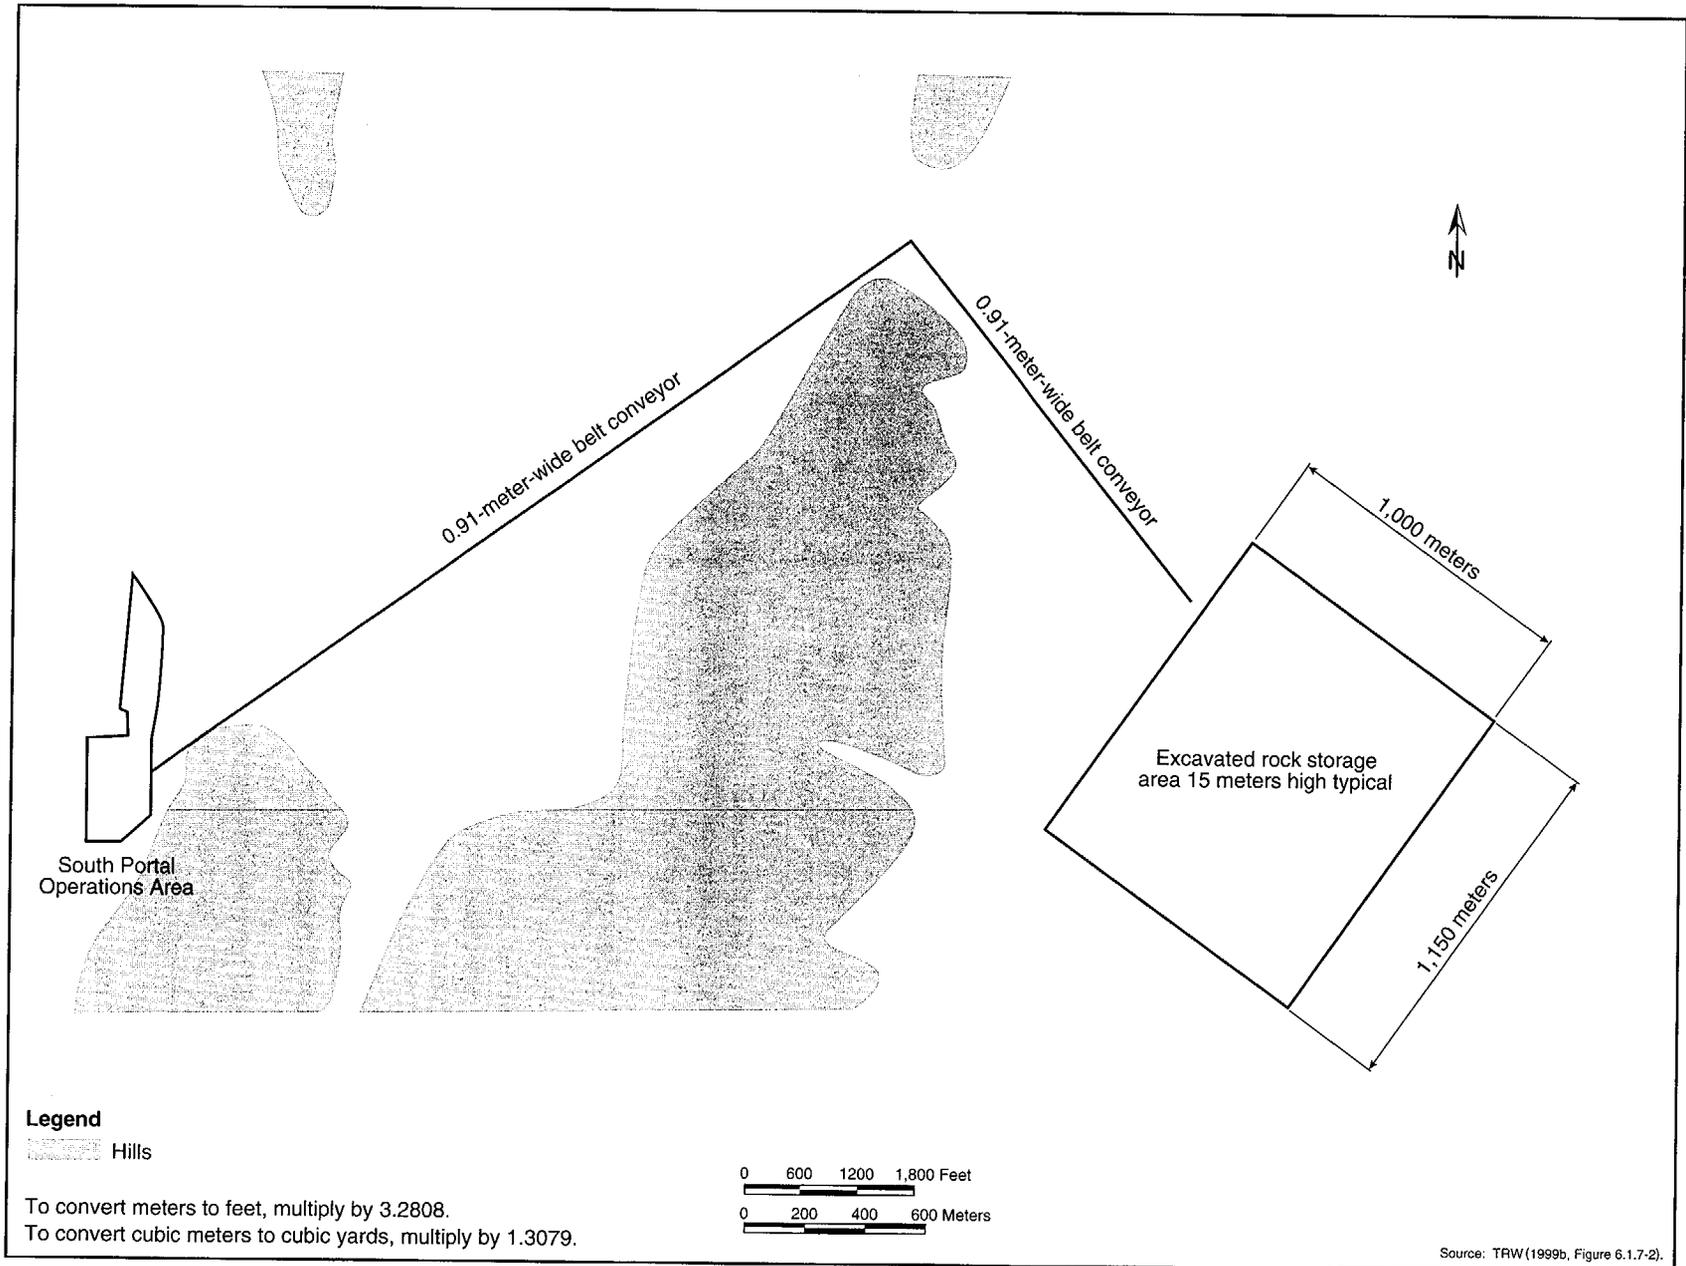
Location of excavated rock storage area for low thermal load scenario.
